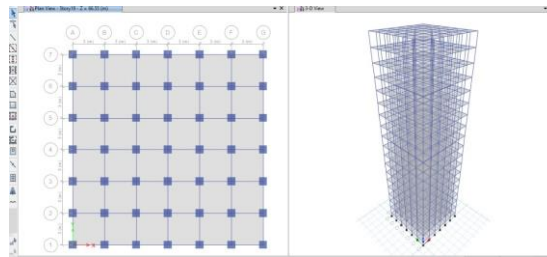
WITHOUT SHEAR WALL FOR REGULAR BUILDING
